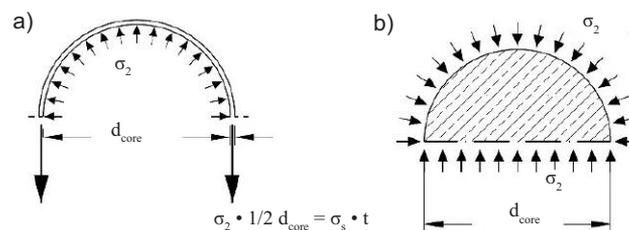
Stress equilibrium in the cross-section of the CFST column: a) steel tube; b) concrete core
